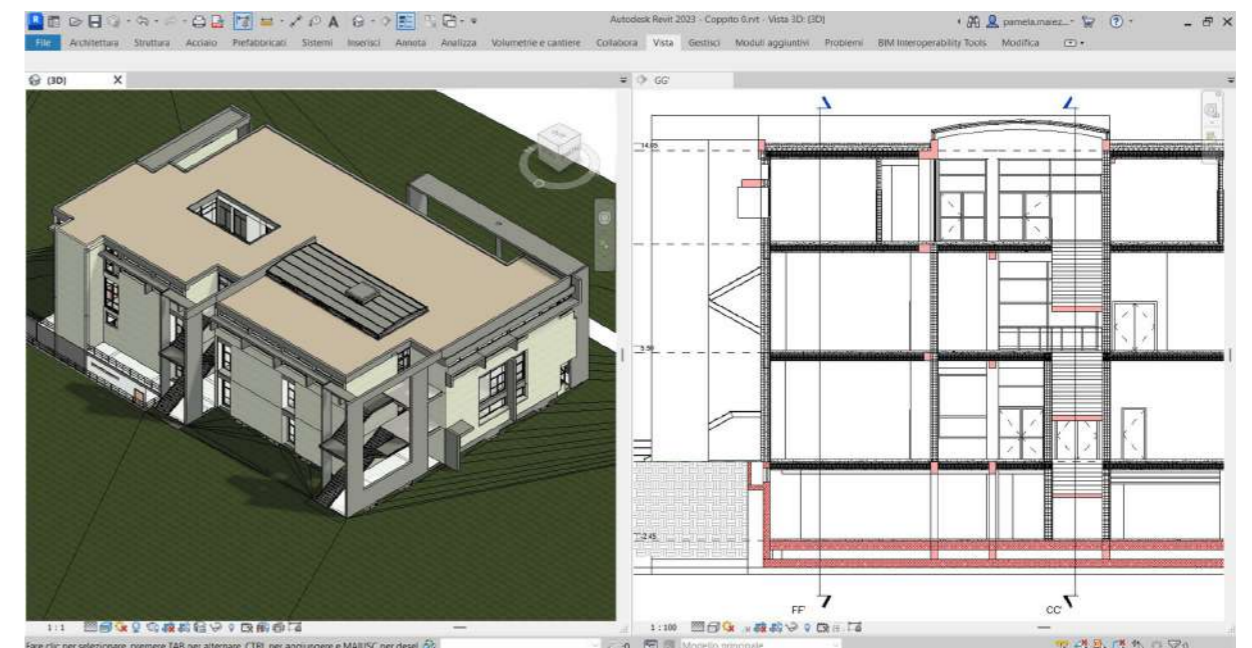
3D view and section of the Alan Turing Building in the BIM environment.
